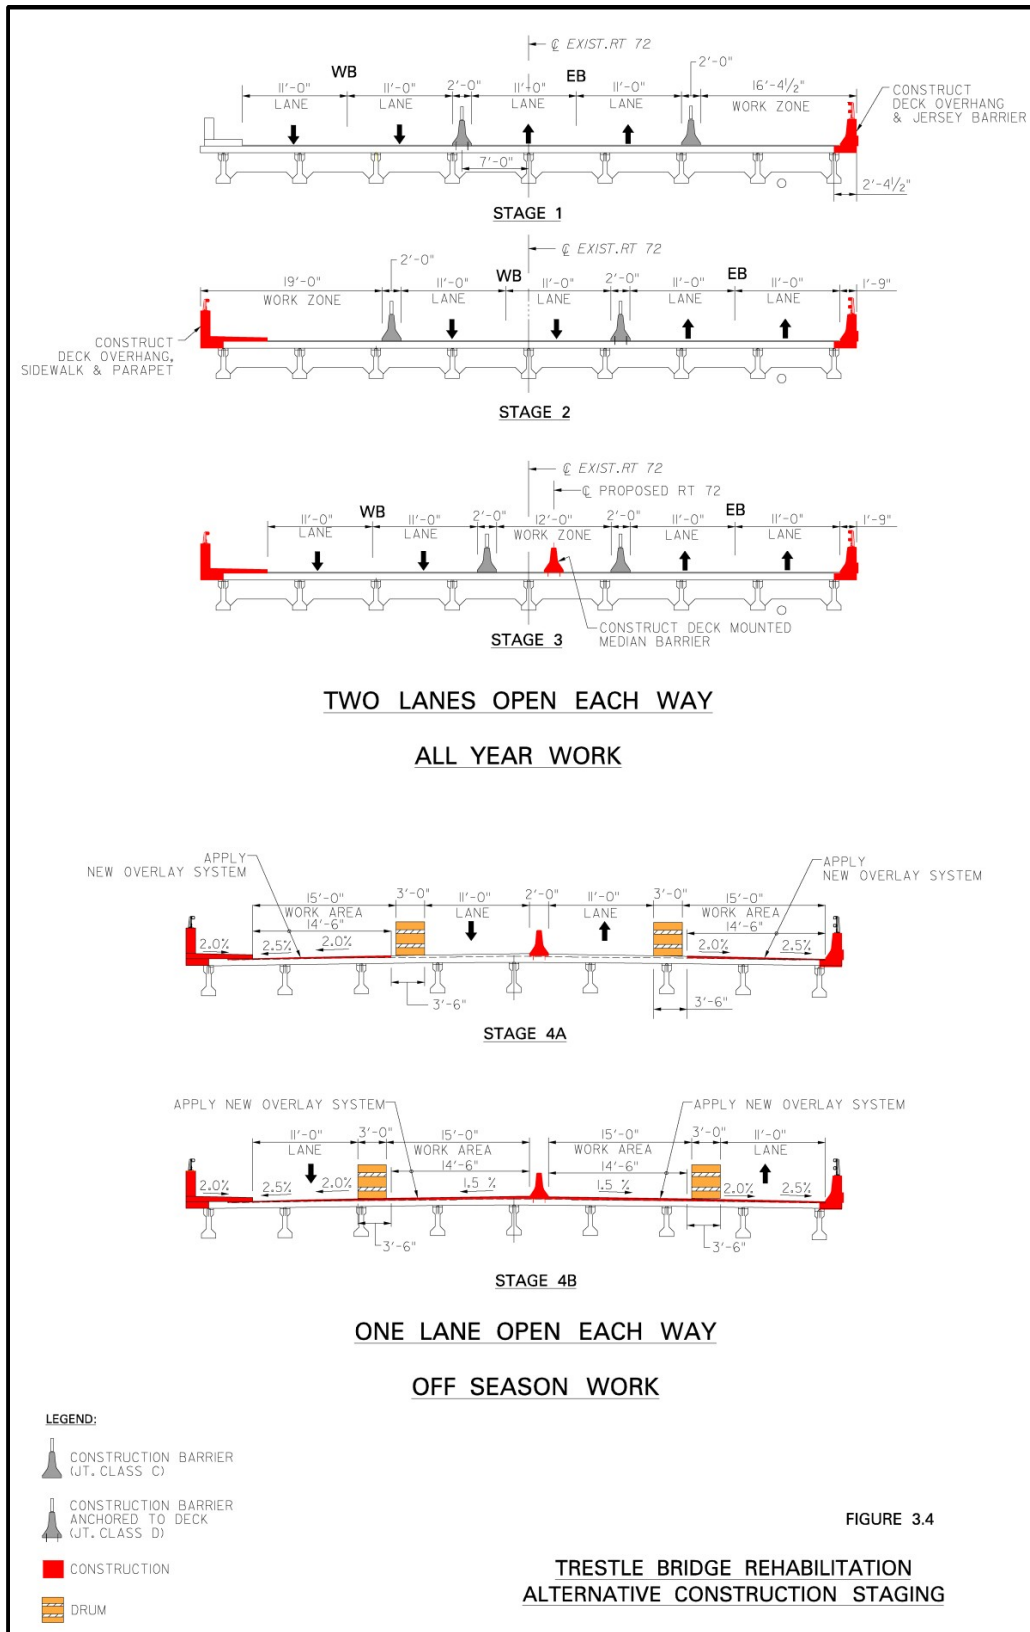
Trestle Bridge Construction Staging (Alternative 1 – Rehabilitation)
